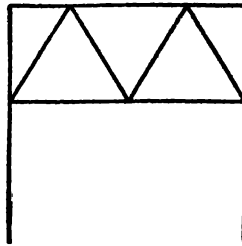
Outline of Sway Bracing Frame for Through Bridges with Polygonal Top Chords.
